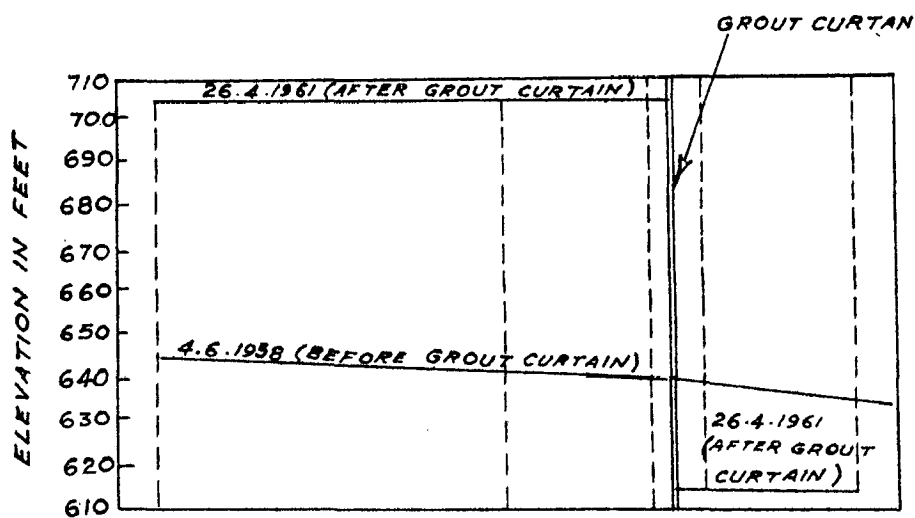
ROCKEY REACH DAM. PIEZOMETRIC LEVELS ACROSS GROUT CURTAIN BEFORE COMPLETION OF THE GROUTING AND AFTER THE FIRST FILLING OF THE RESERVOIR
